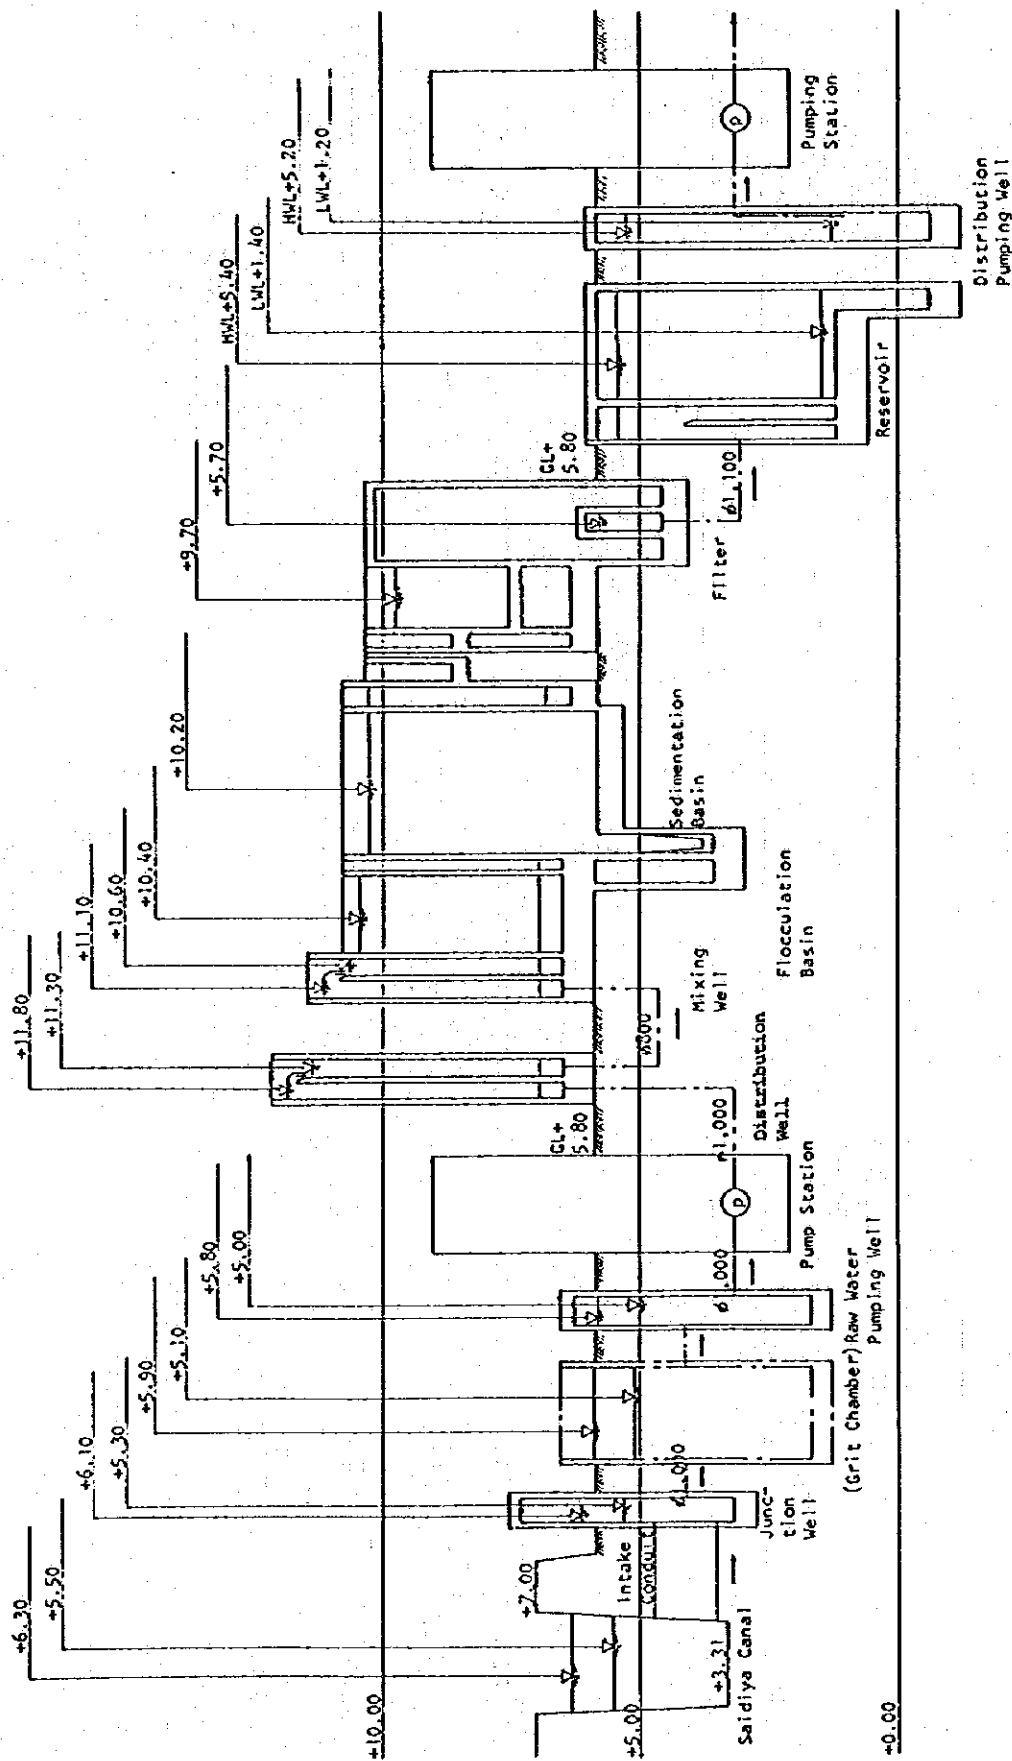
WATER LEVEL DIAGRAM OF New Northeast Plant
